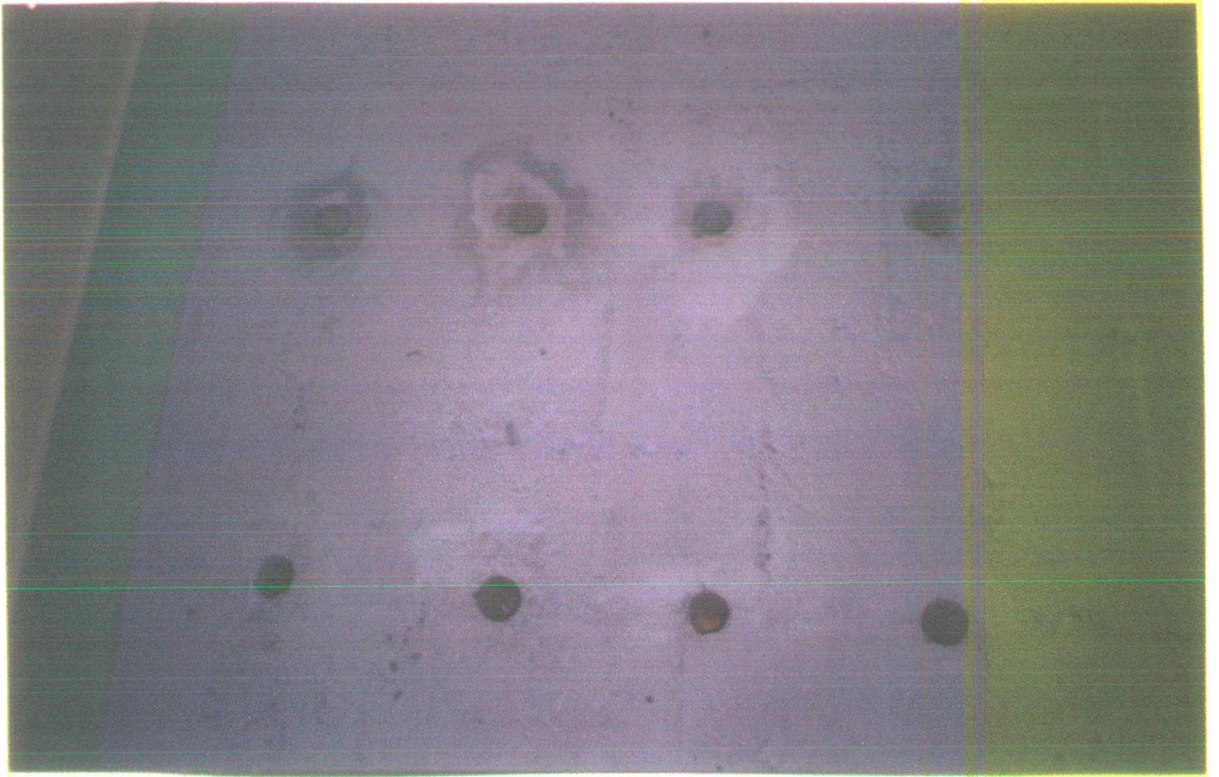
View of Opening Provided in R.C.C. Roof to Pass Hot Air
